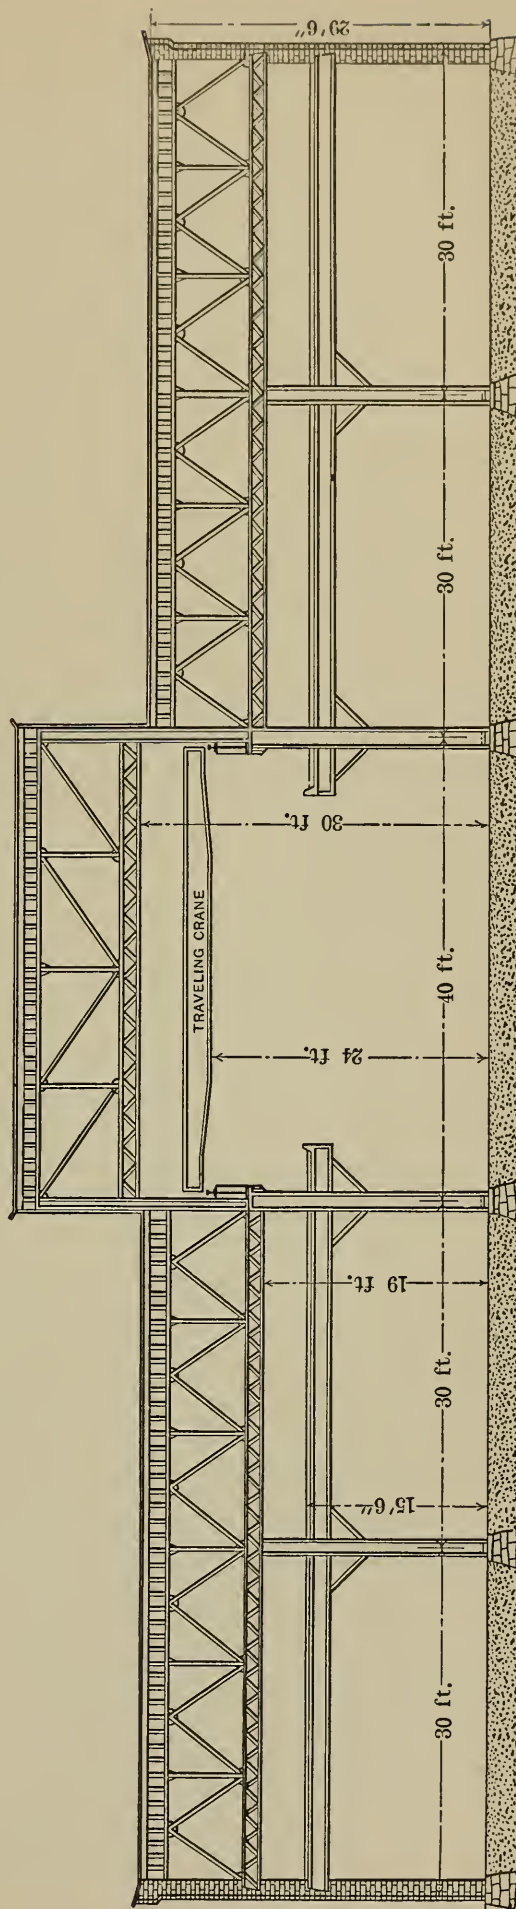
Transverse Section of Machine Shop with Saw-tooth Roof of Steel Construction.
